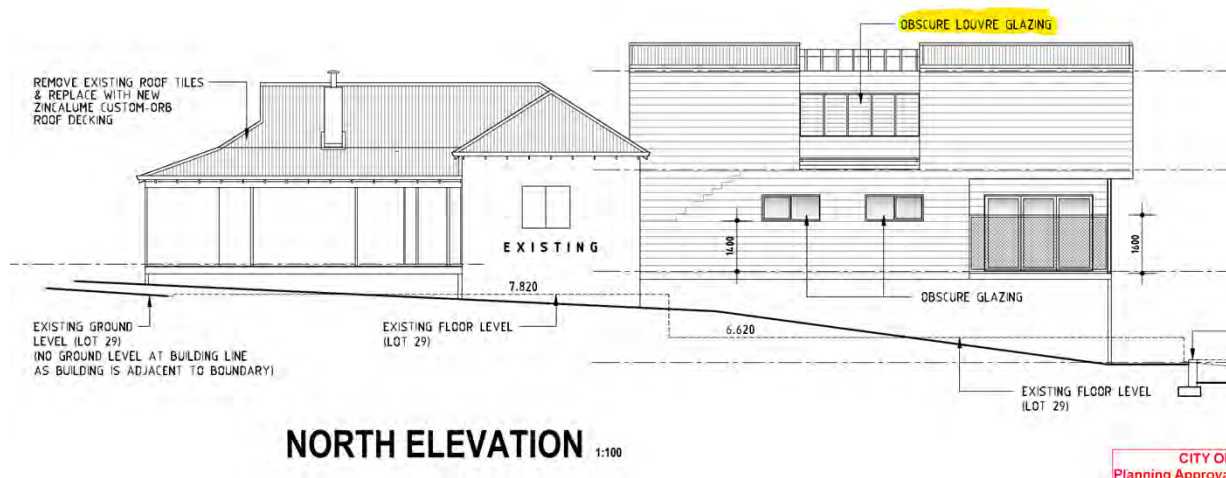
Extract of approved plans, northern elevation, application ref. VA0012/23.
